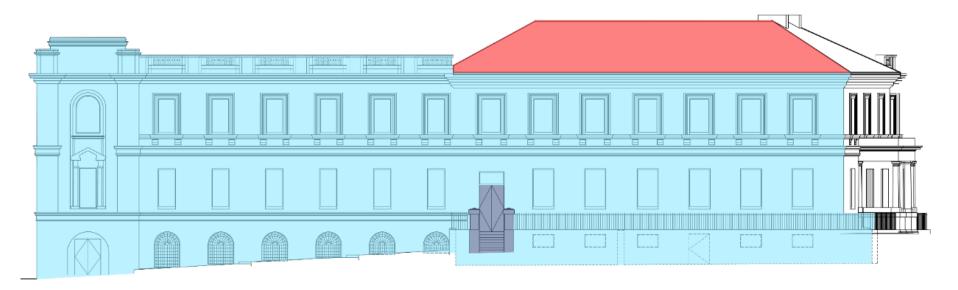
Grading Diagrams – Grading of Visible Fabric (Bridge Street Façade)
